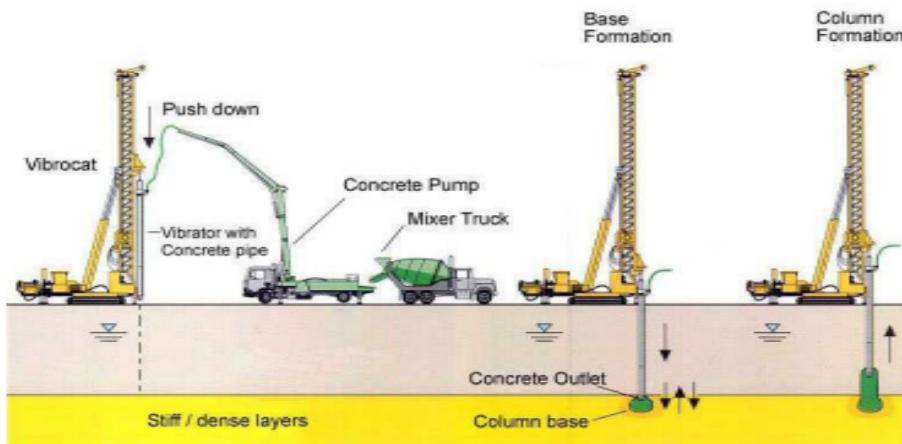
Schematic showing the installation of Vibro Concrete Columns (VCC)
